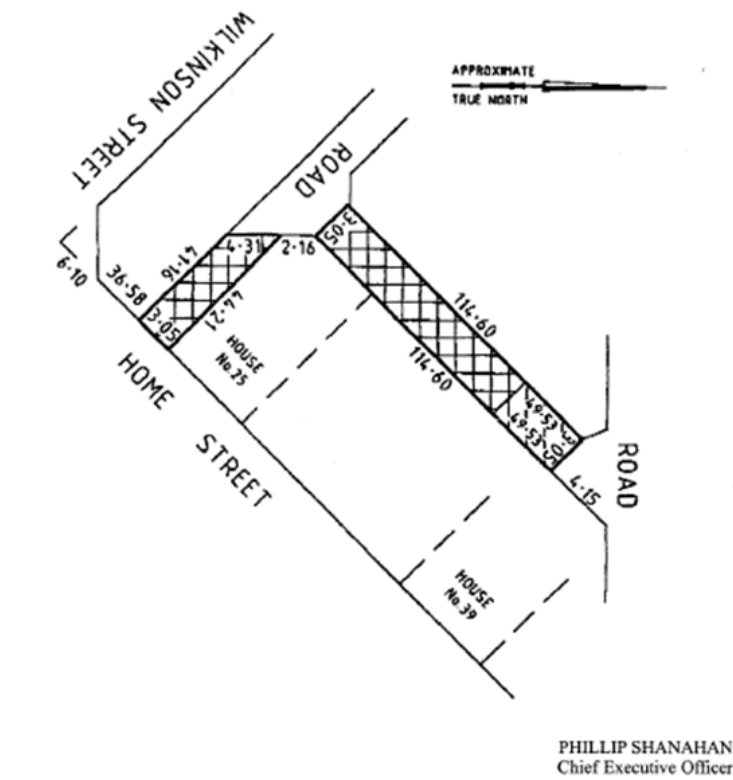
Title Plan Discontinued road adjoining 31 Home Street and 18 Doolan Street, Reservoir
